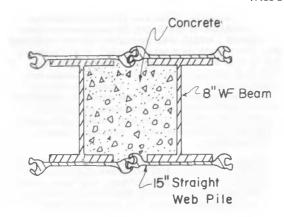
Details of the Sheet-Pile Wall Installed at Swift Dam No. 1, Washington
